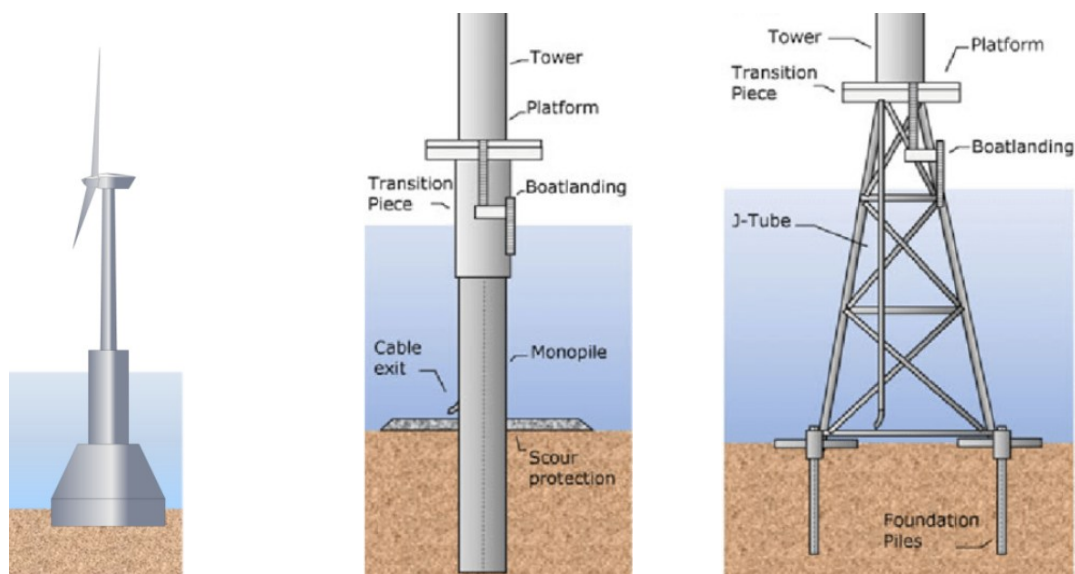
General arrangement drawings of individual foundation types (left): gravity-base foundation; monopile; jacket foundation (source: https://www.obayashi.co.jp/chronicle/130th/en/archives/chapter4_1_5.html# and: https://www.researchgate.net/figure/Three-types-of-turbine-foundations-Monopile-a-jacket-b-and-gravity-based-c_fig2_315874967)
